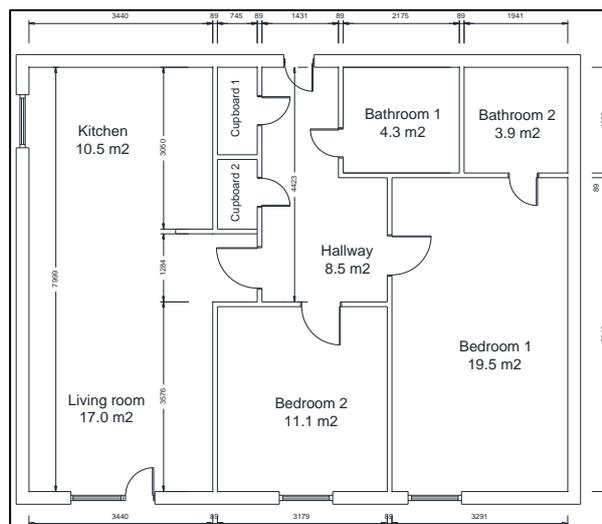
Floor plan of the purpose built flats (Not to scale – dimensions in mm)
